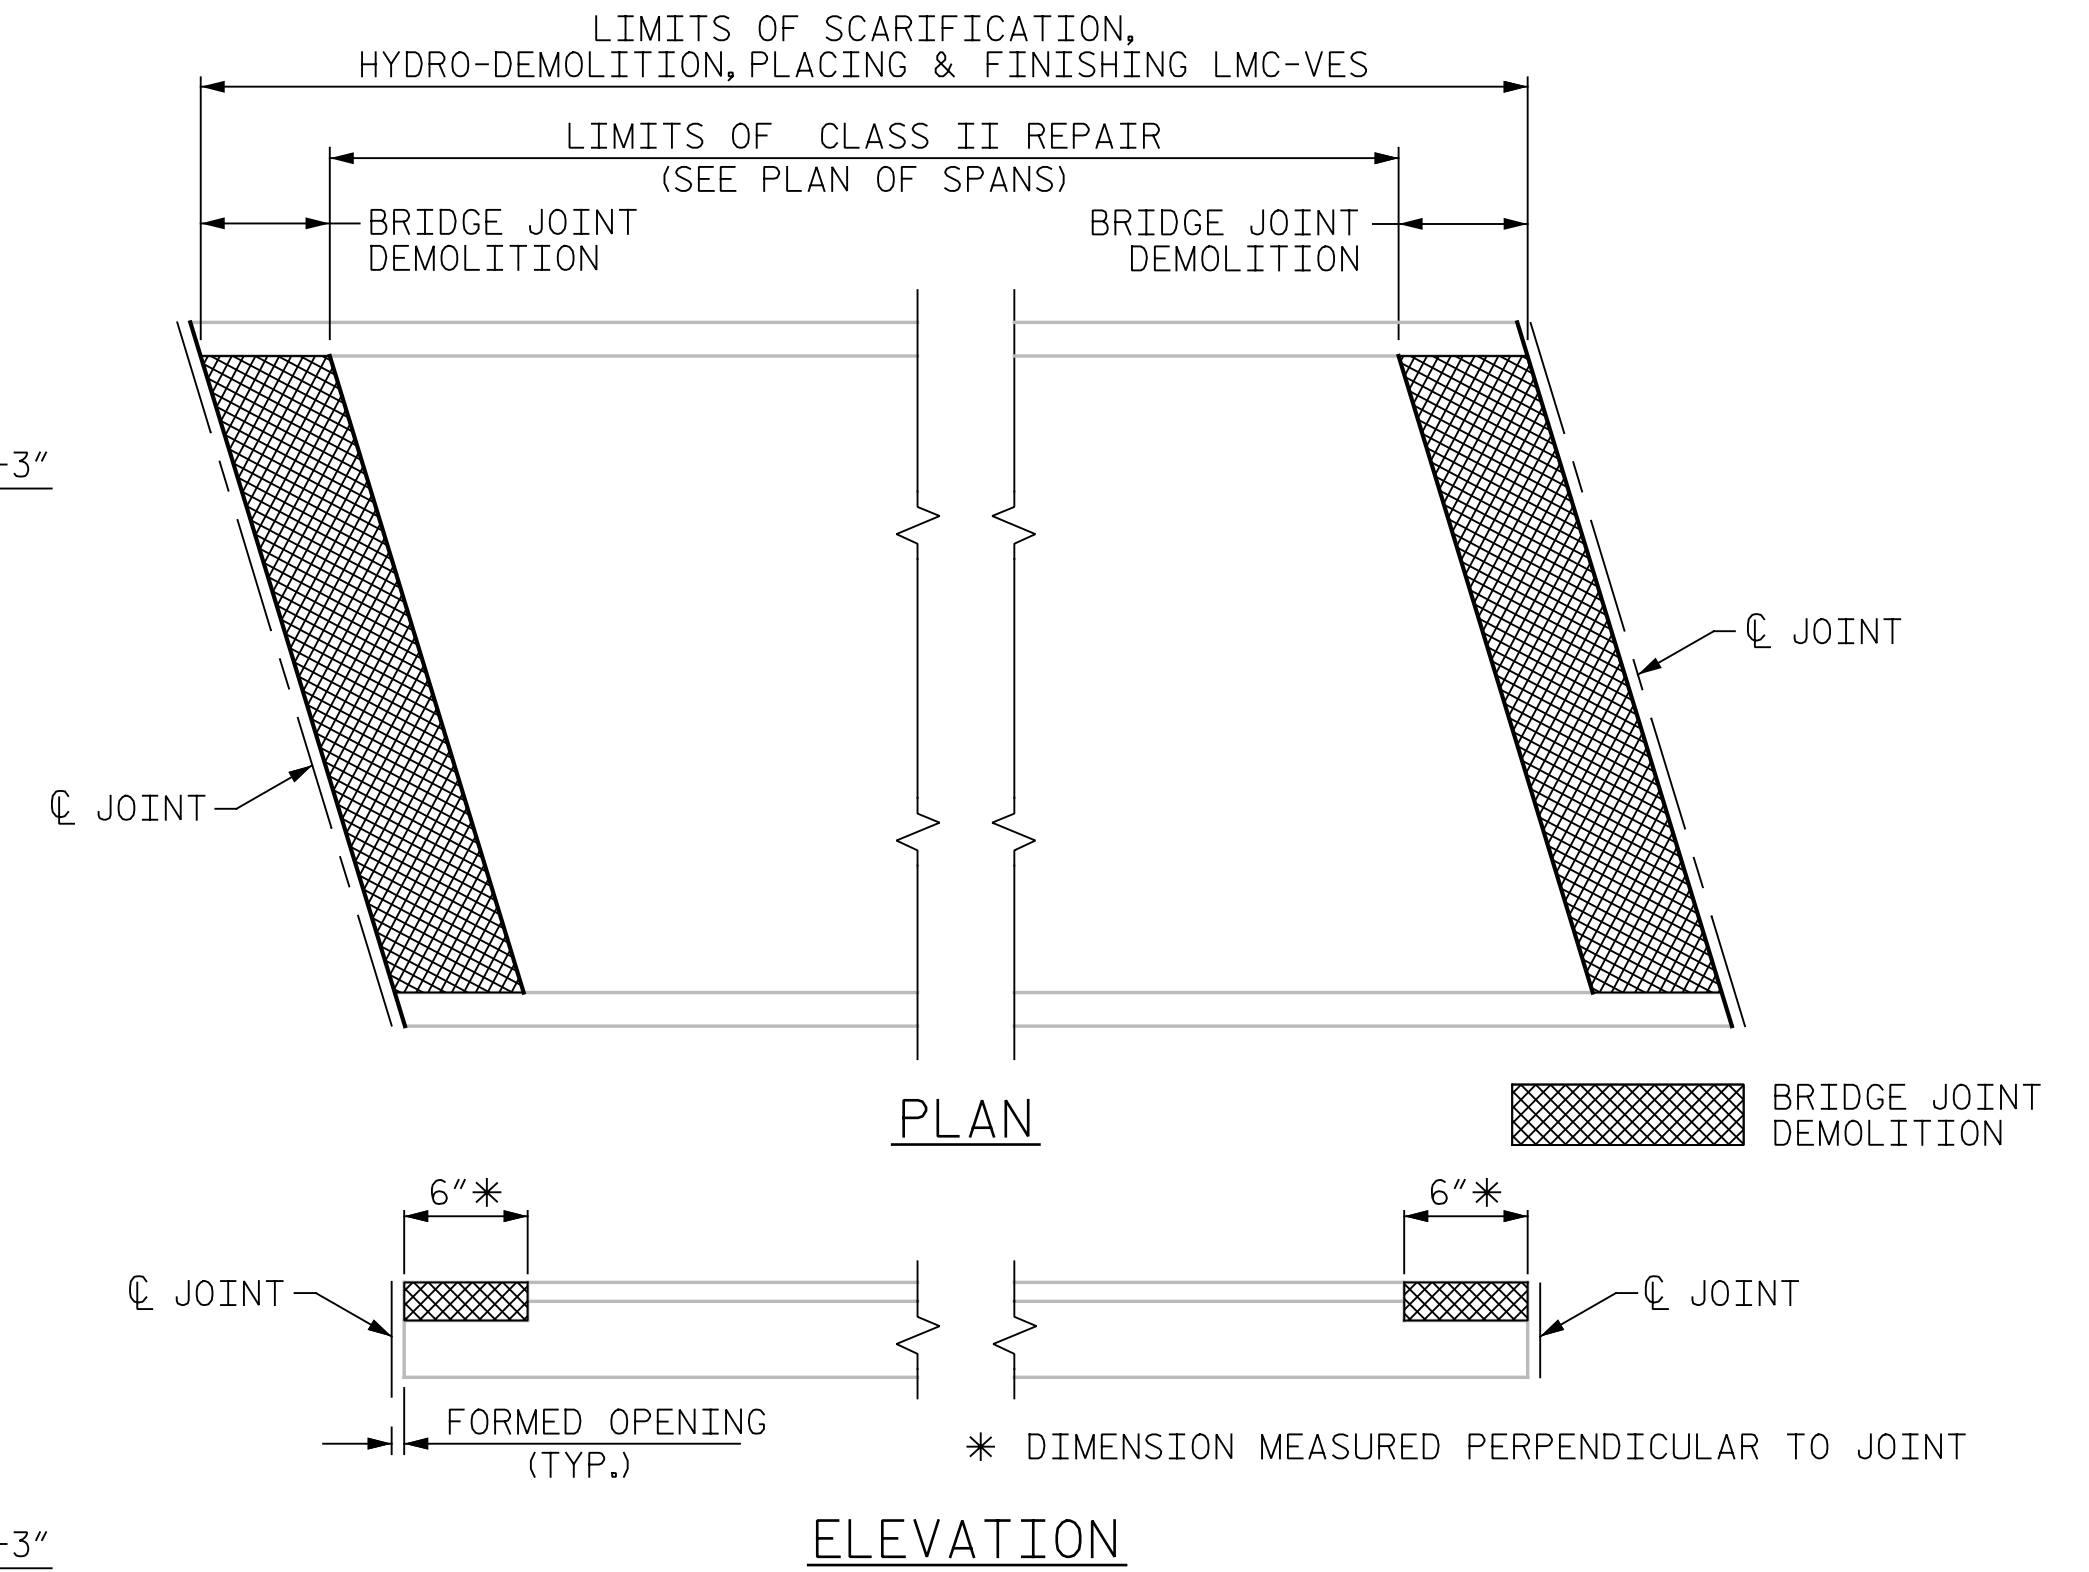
DETAIL FOR LATEX MODIFIED CONCRETE - VES OVERLAY
